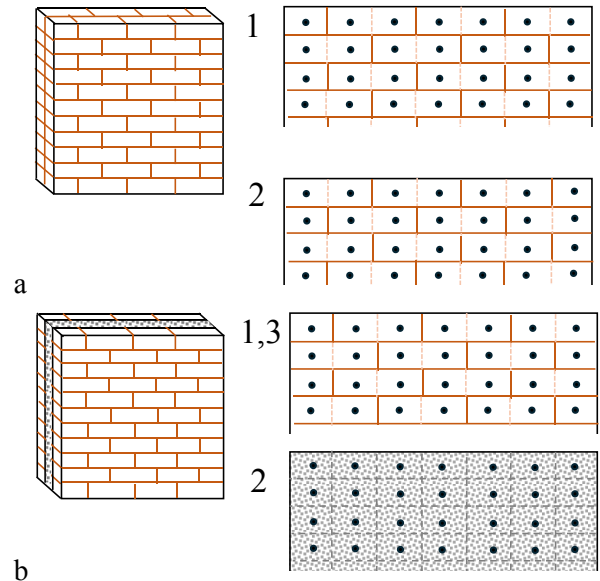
; Two-leaf masonry panel having leaves with different running bond texture, detail of brick subdivision into half-block portions for each layer (a). Three-leaf panel with external masonry leaves and inner core, detail of brick subdivisions for external layers and inner core discretization (b). [Orange continuous lines = mortar (or dry) joints, orange dashed lines = inner brick potential cracks, grey dashed lines = homogeneous material subdivisions/potential cracks]
